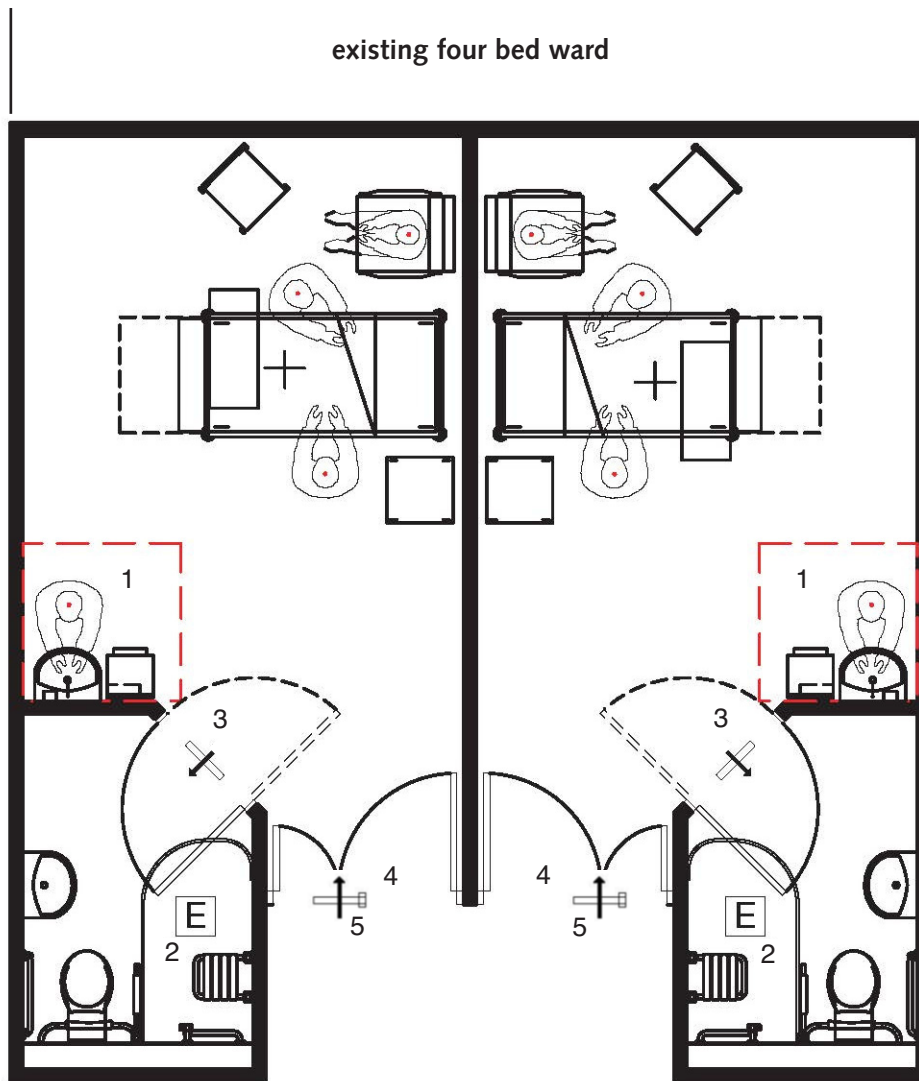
Upgrading existing four-bed ward to provide two single-bed rooms with en-suite facilities (segregation/negative pressure rooms).
